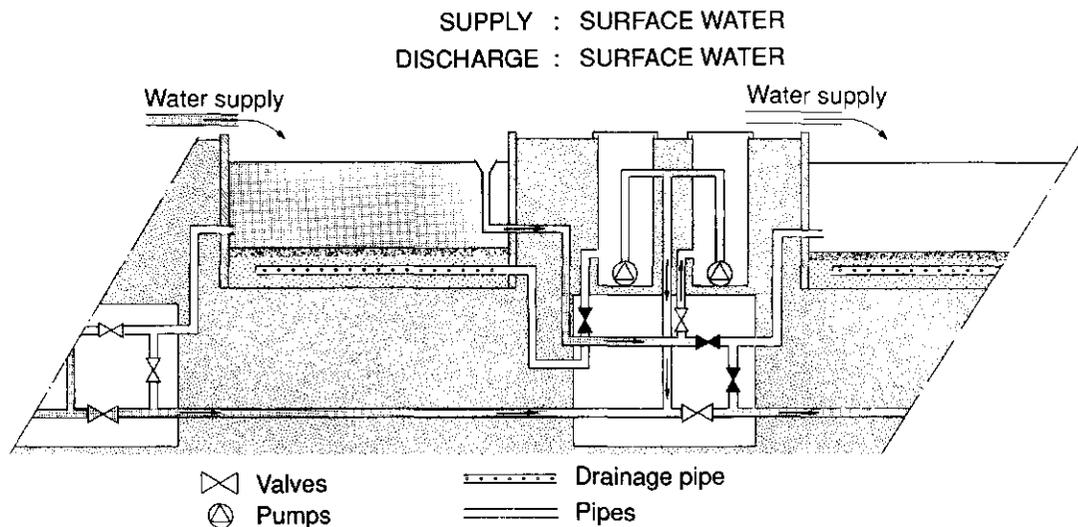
Longitudinal section of ditches, pipes and fittings of the experimental ditches
